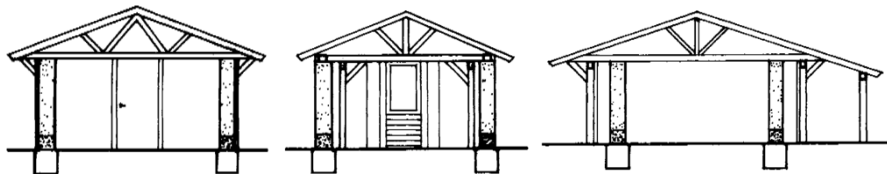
Examples of separated roof dispositions, by Gernot Minke
